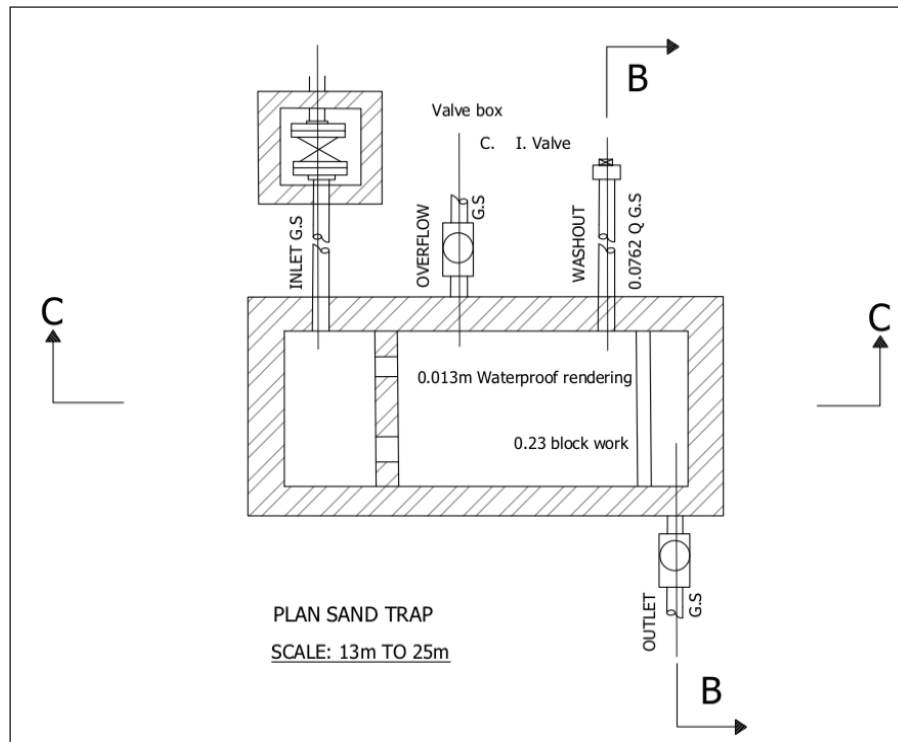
Typical Layout Plan of a Sand Trap for a Small Scheme
